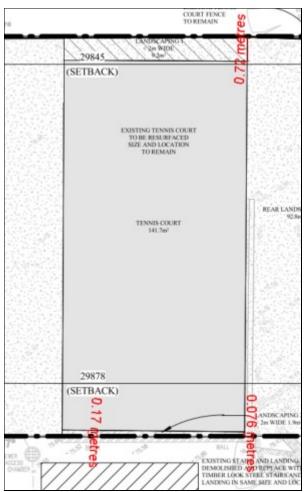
Excerpt from Proposed Site Plan (source: Architectural Plans by Dellview Designs)
